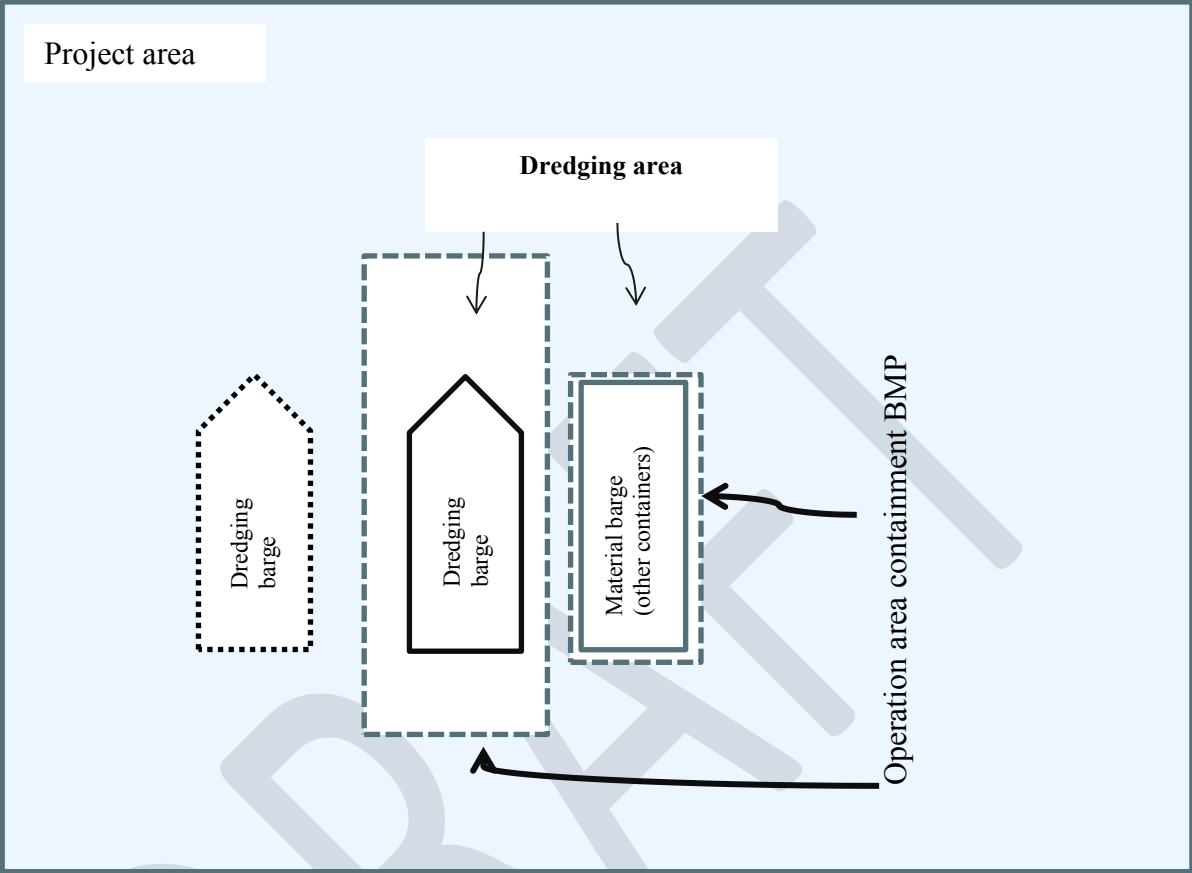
Containment BMP installed around dredging barge and material barge as one unit - Material barge stays in the project area for dewatering (note: dredging barge can be operated outside the dredging containment BMP)
